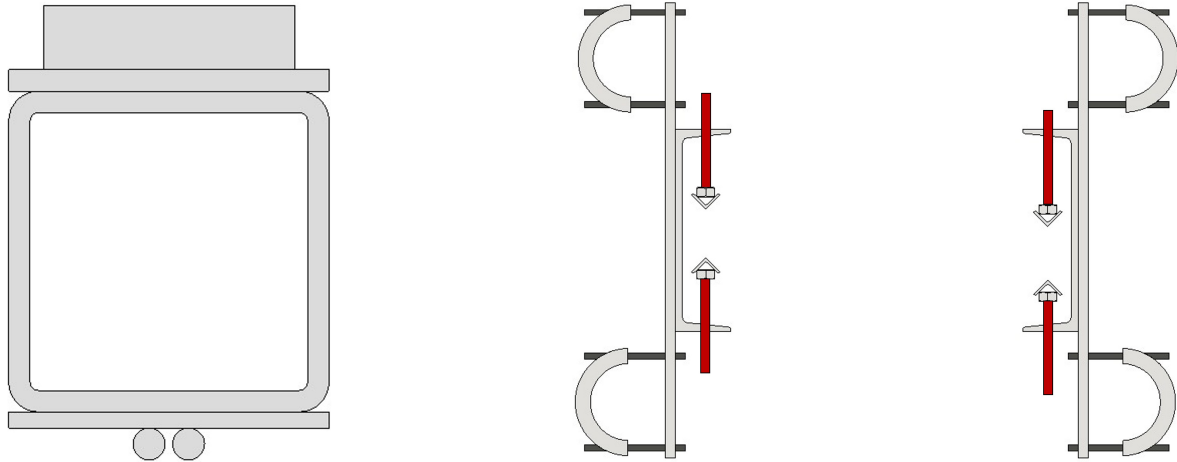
Side view of the RHS profile showing the steel rod constraints (left), and a top view of the setup showing the V-shaped bolted element constraints (right)
